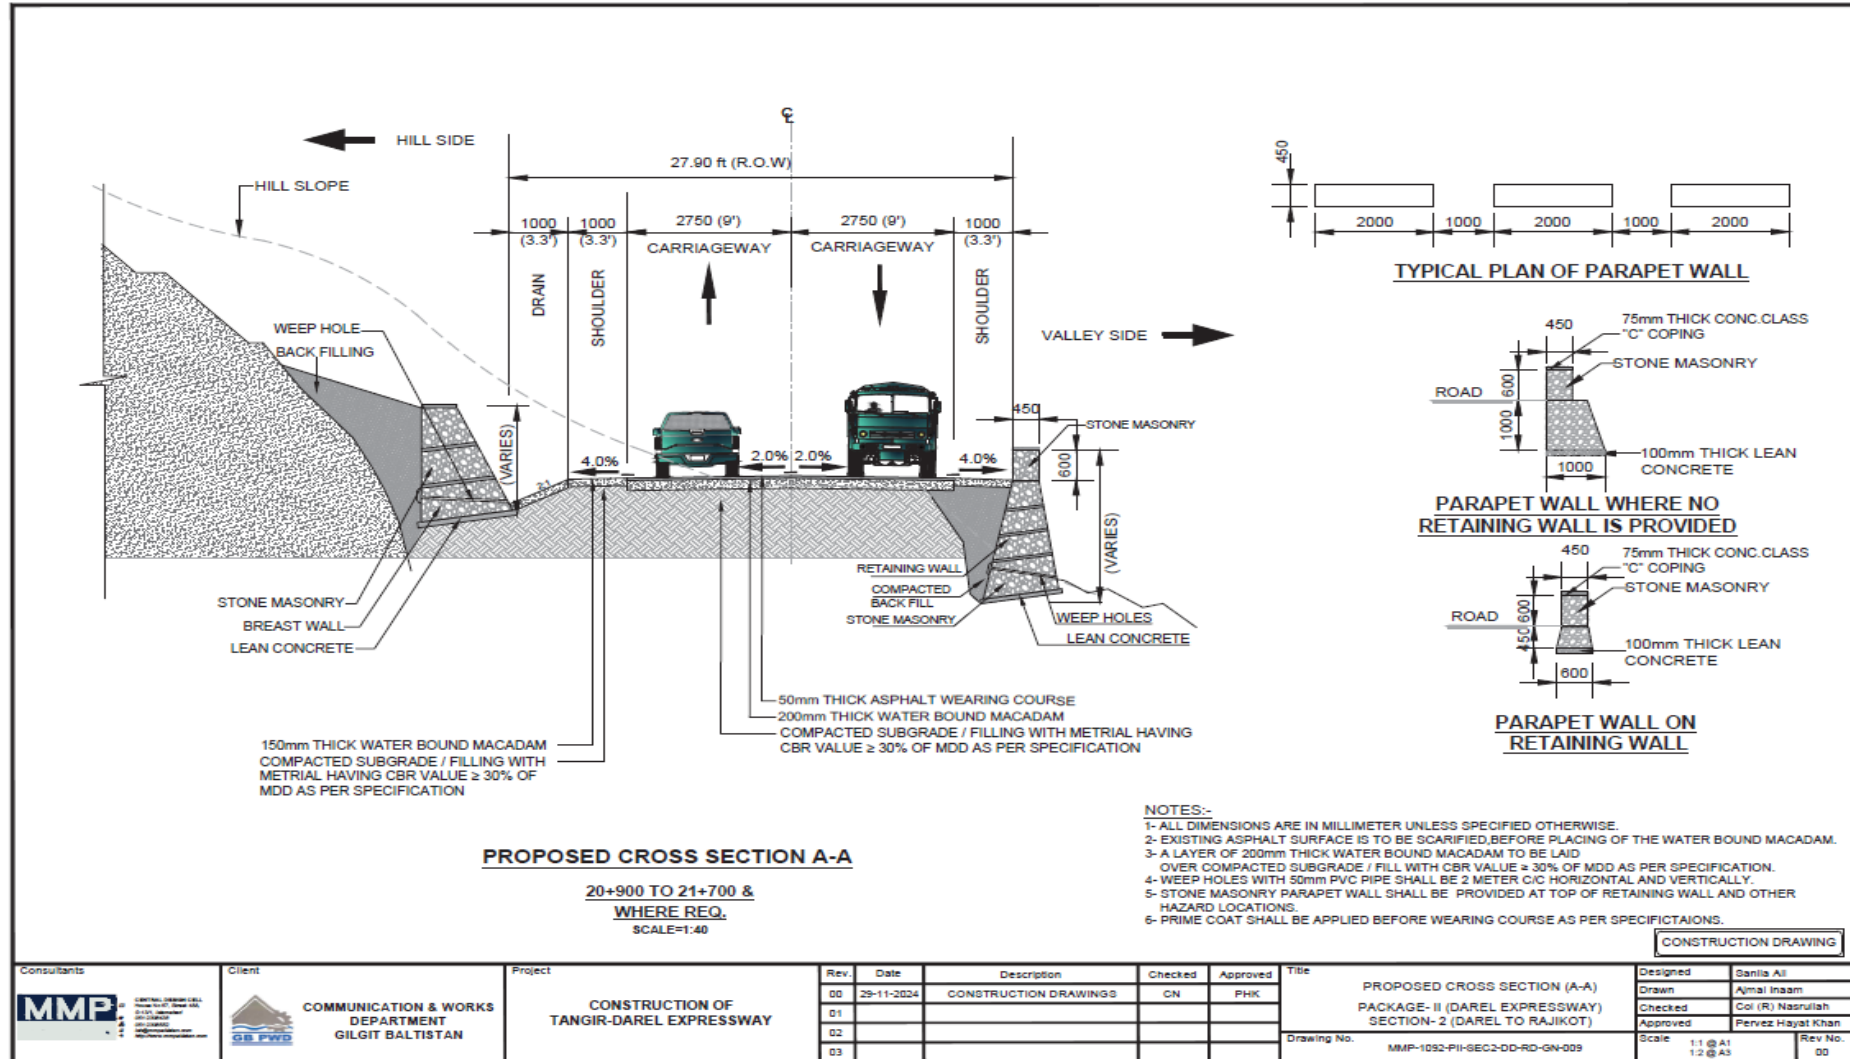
Typical Cross-section of Darel Expressway (Package -II Section-2)
